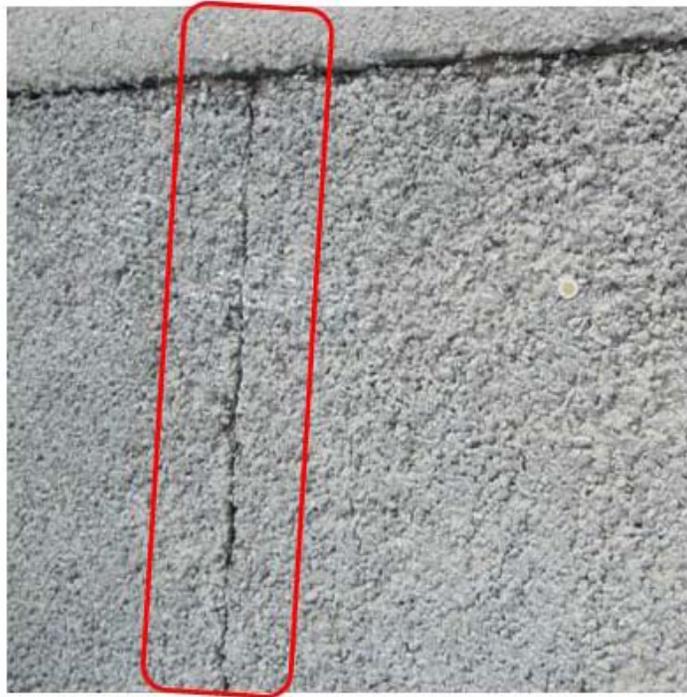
Saw Cut Joint Site 5 August 2010 (22 Months)
